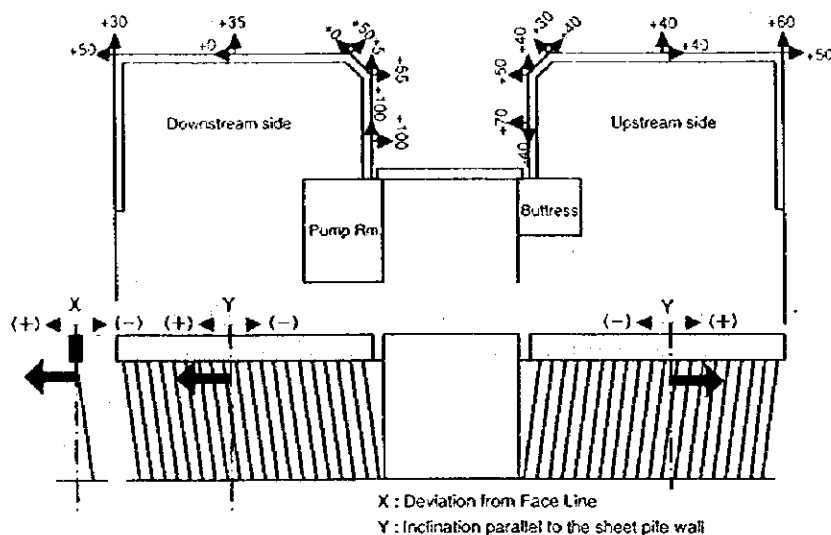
Measuring Record of Inclination of Steel Sheet Pile Wall
